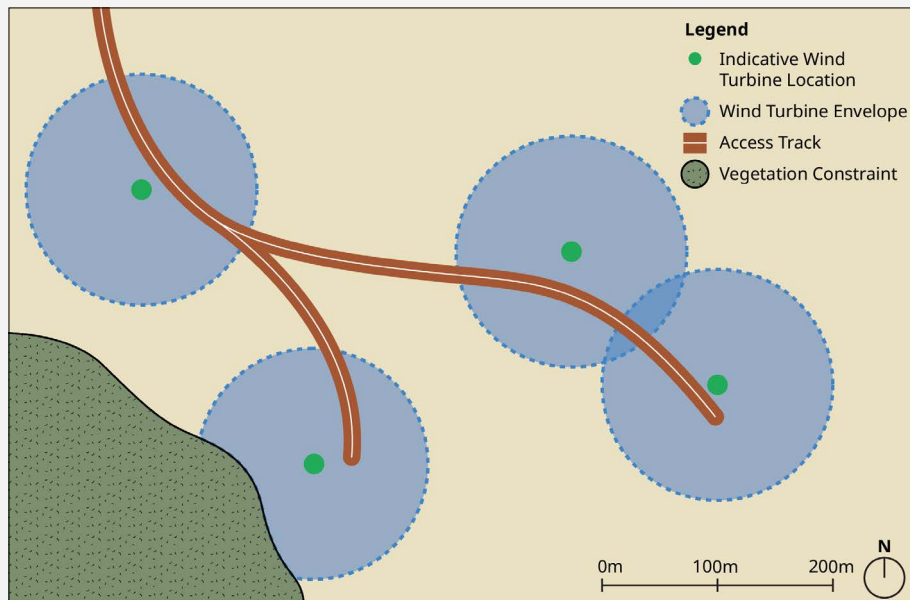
Example site plan showing wind turbine envelopes for micro-siting post-development approval
